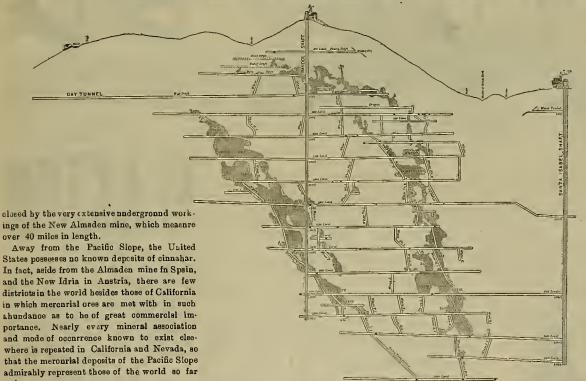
EAST AND WEST VERTICAL SECTION, NEW ALMADEN MINE.
